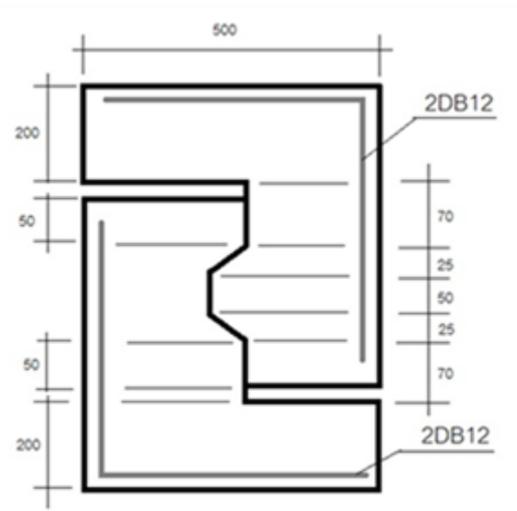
Shape and dimensions of specimen, with thickness of 200 mm.
